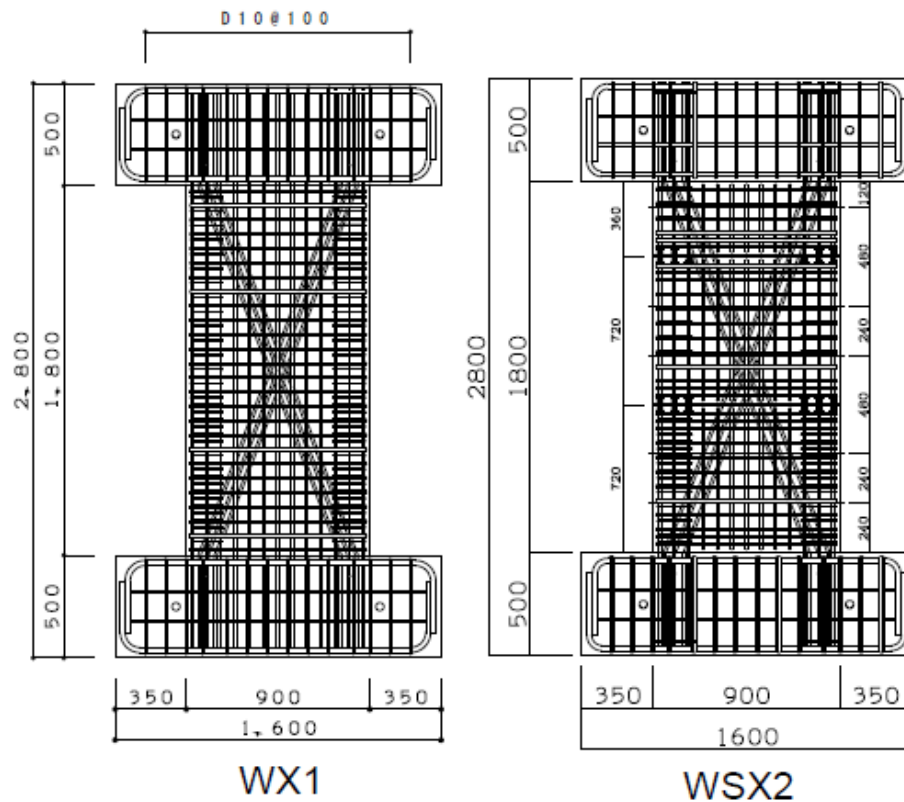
Reinforcement details of specimens WX1 and WSX2 tested by Shimazaki (2008) (all dimensions are in mm.)
